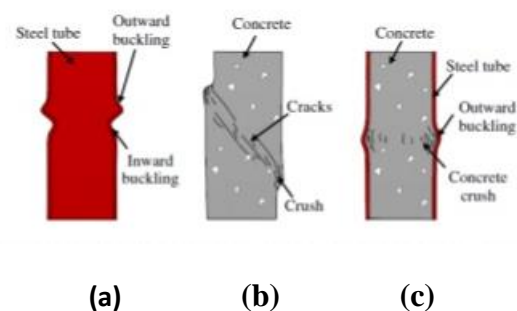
Failure of simple hollow steel tube, concrete and CFST columns.
